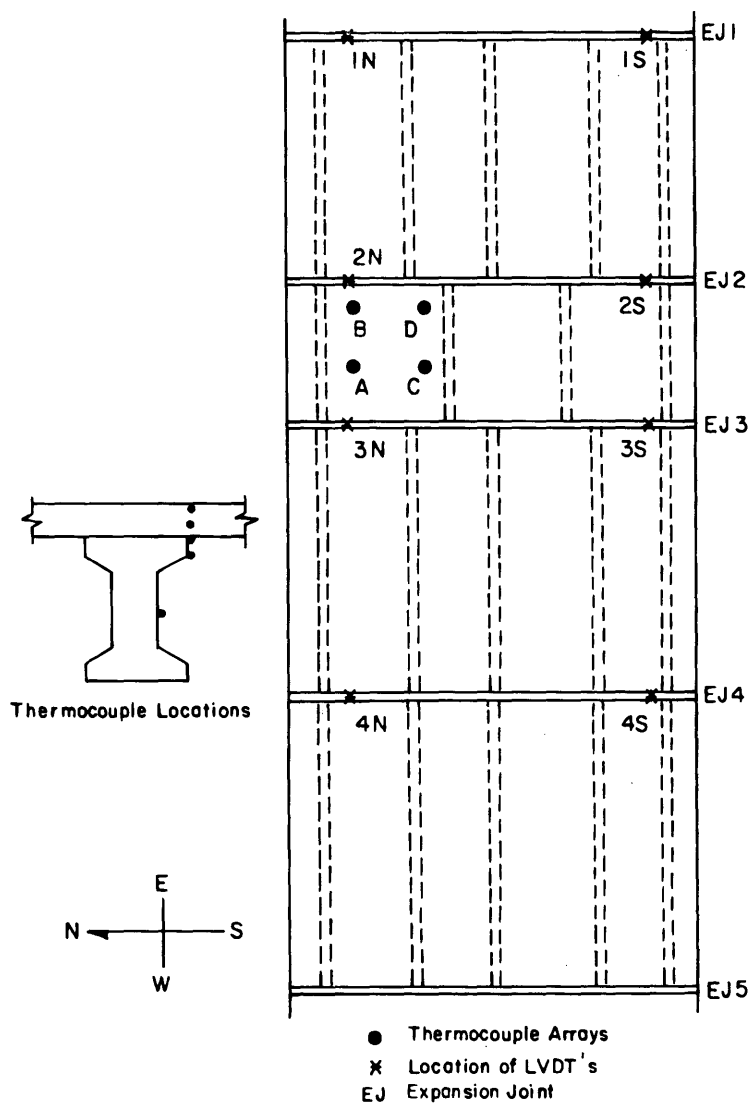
Plan view of bridge showing locations of LVDTs and thermocouples.
